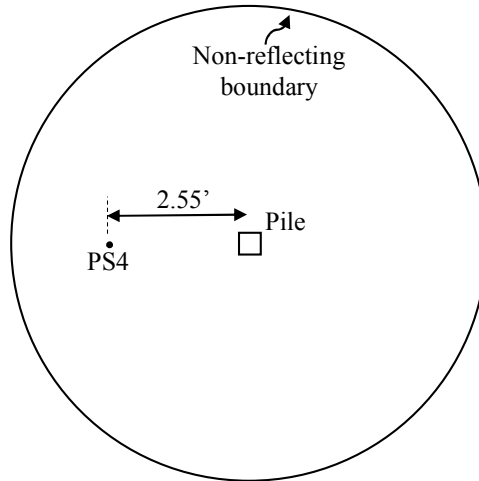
Schematic sketch of location of pressure sensor PS4 – plan view (refer to Fig. 3.11 for details of non-reflecting boundary)
